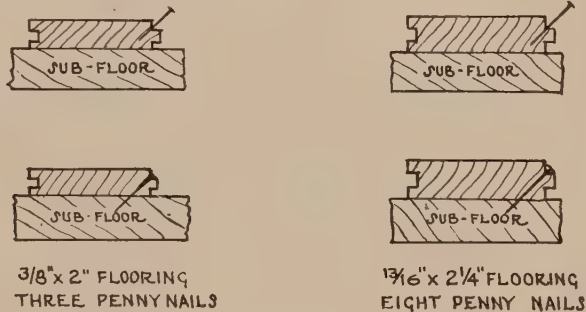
Showing initial and final position of three-penny finishing nails and eight-penny cut flooring nails.
